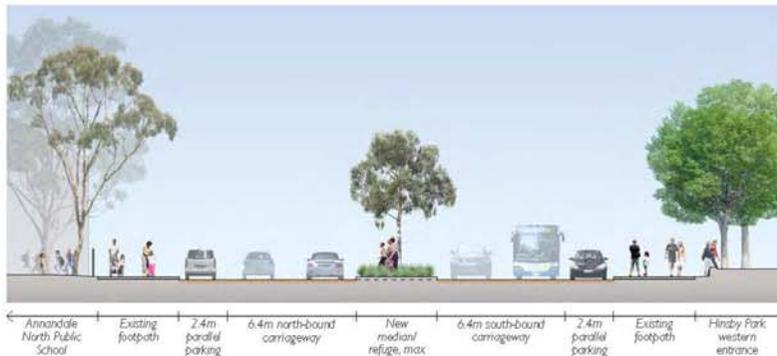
INDICATIVE SECTION THROUGH JOHNSTON STREET AT HINSBY PARK, 1:200 @A3
